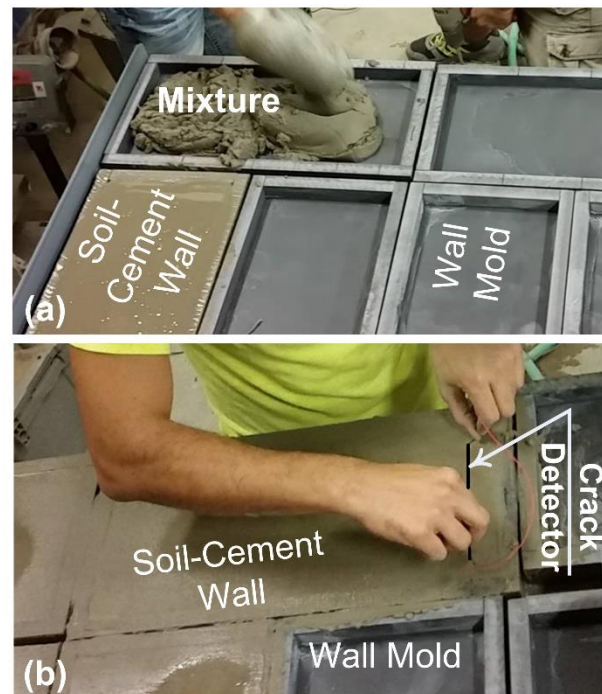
Soil-cement wall construction procedure: a) pouring the soil-cement mixture in the molds, b) placing crack detector in the walls
